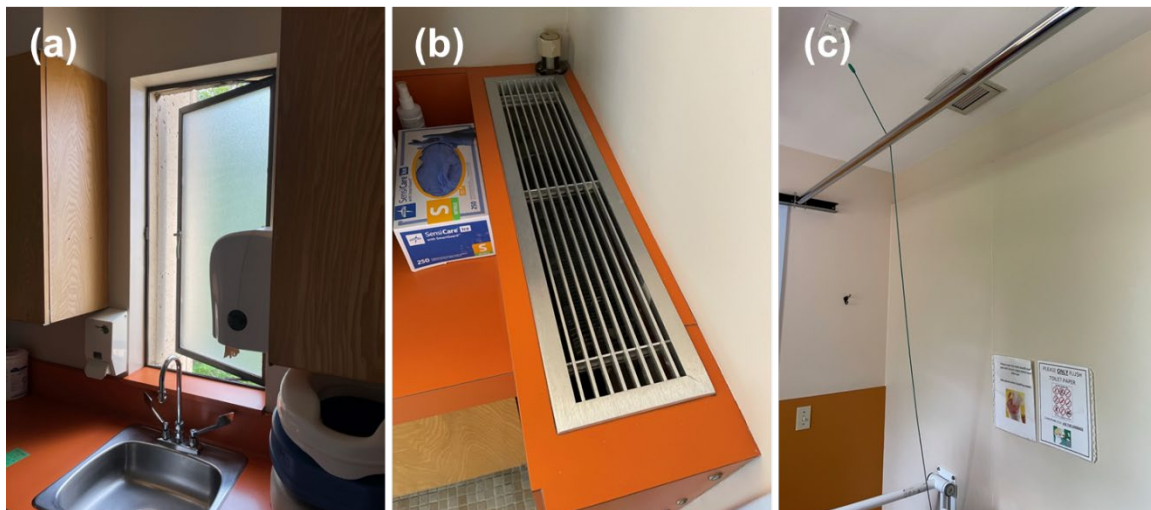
HVAC system terminal units for a typical patient washroom in RC New Building include (a) operable window, (b) radiant heater, and (c) return air grille.
